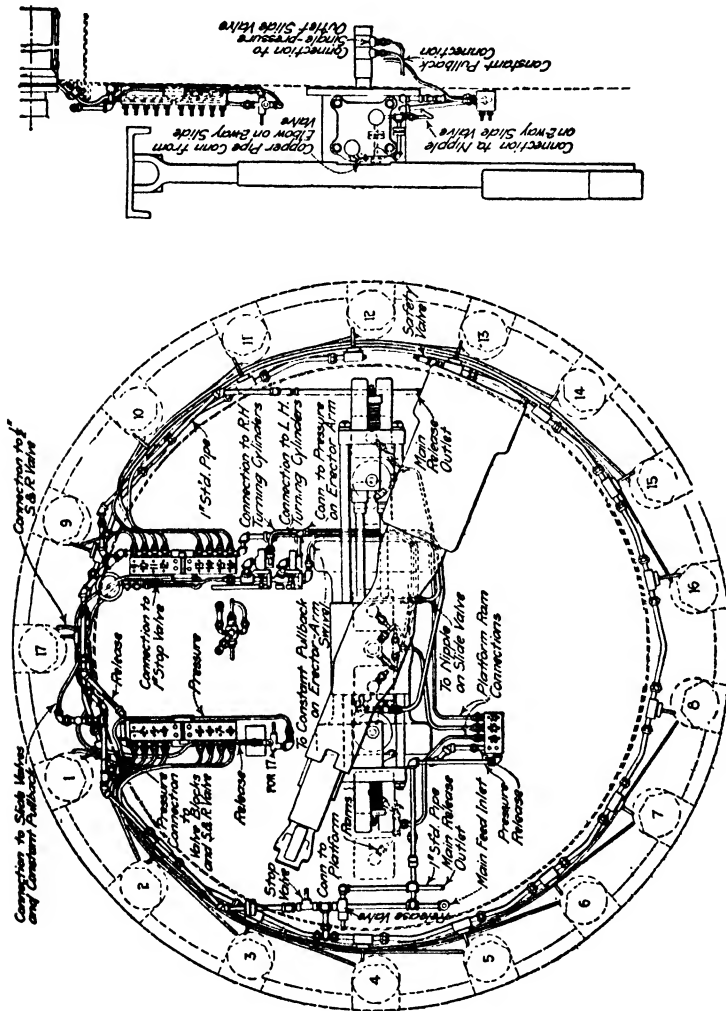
Rear view of a shield, showing hydraulic equipment.
